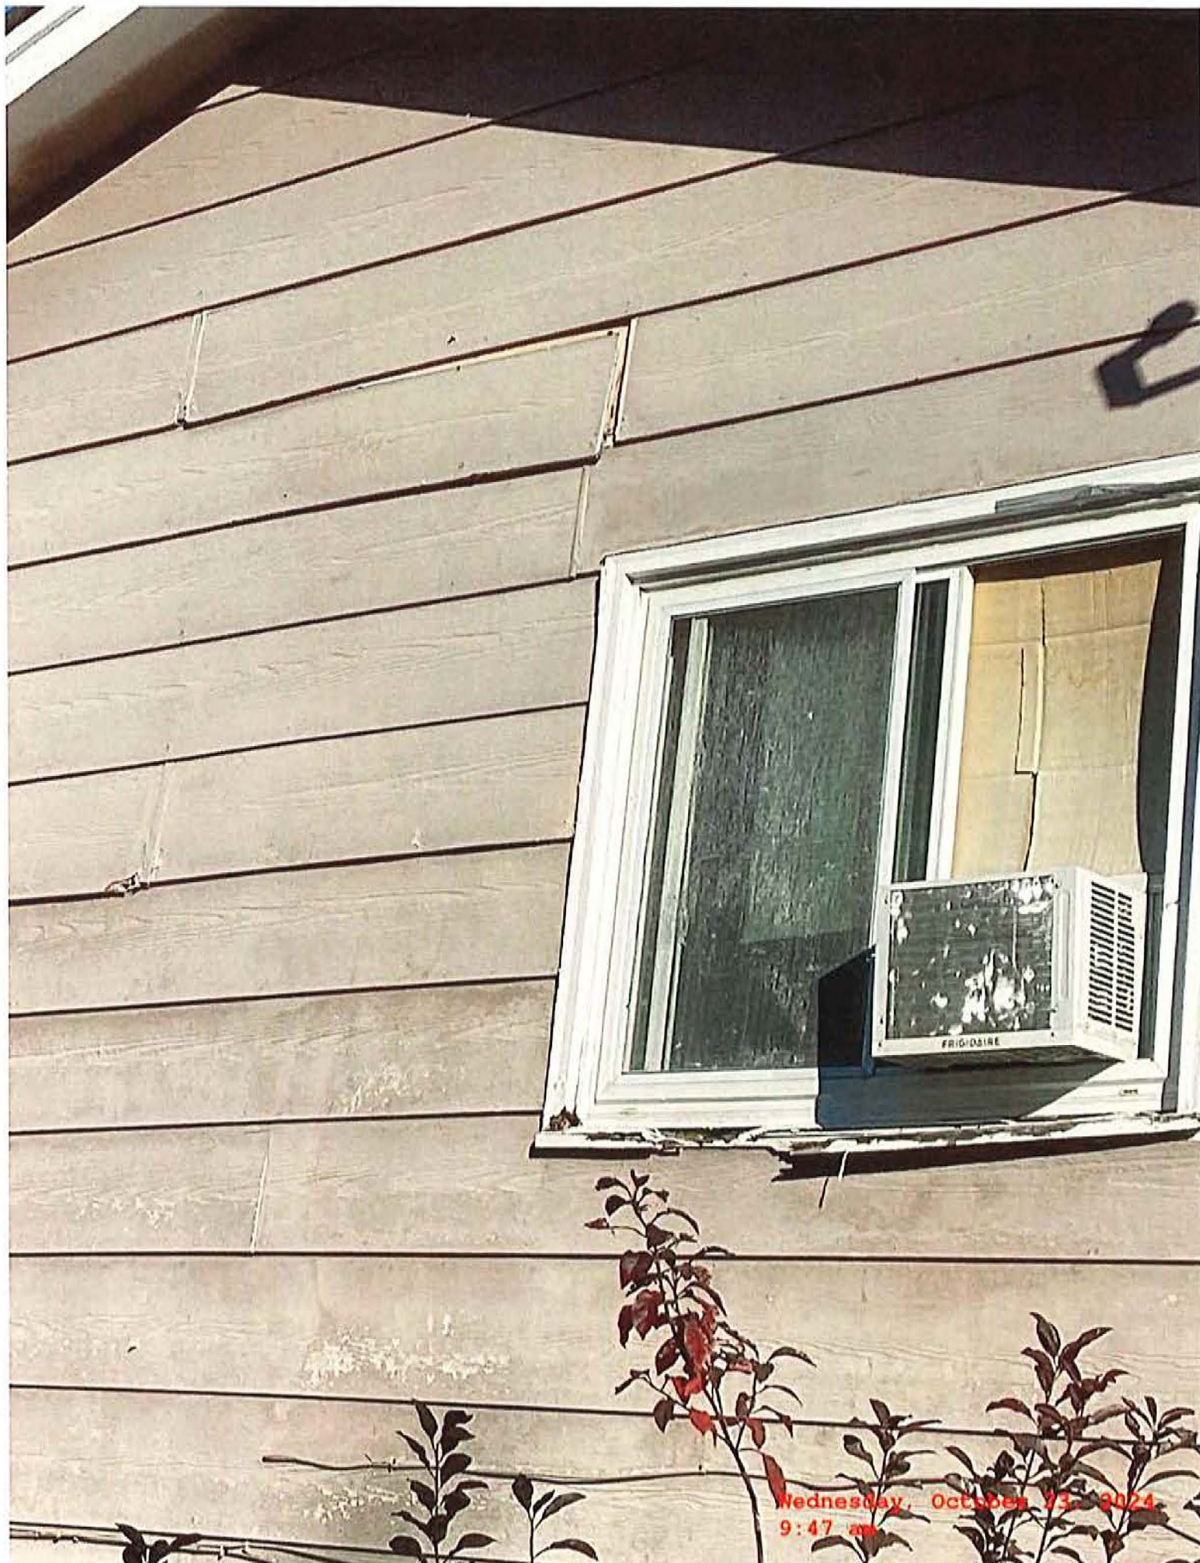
UPPER FLOOR SOUTH WINDOW DAMAGE
